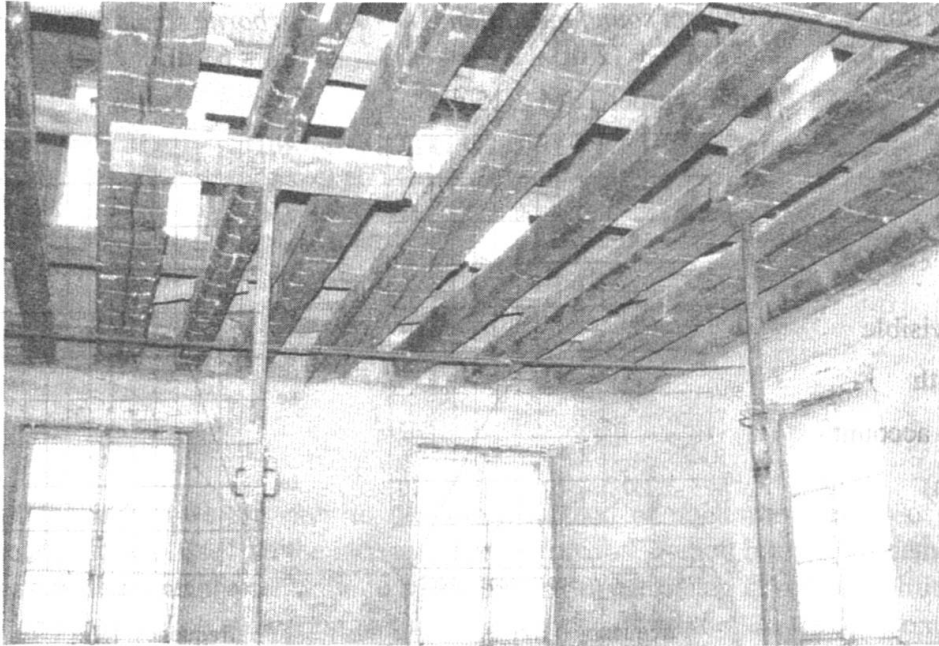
'Salzburger Decke' - 'Salzburg-type floor' after uncovering the existing timber beams
